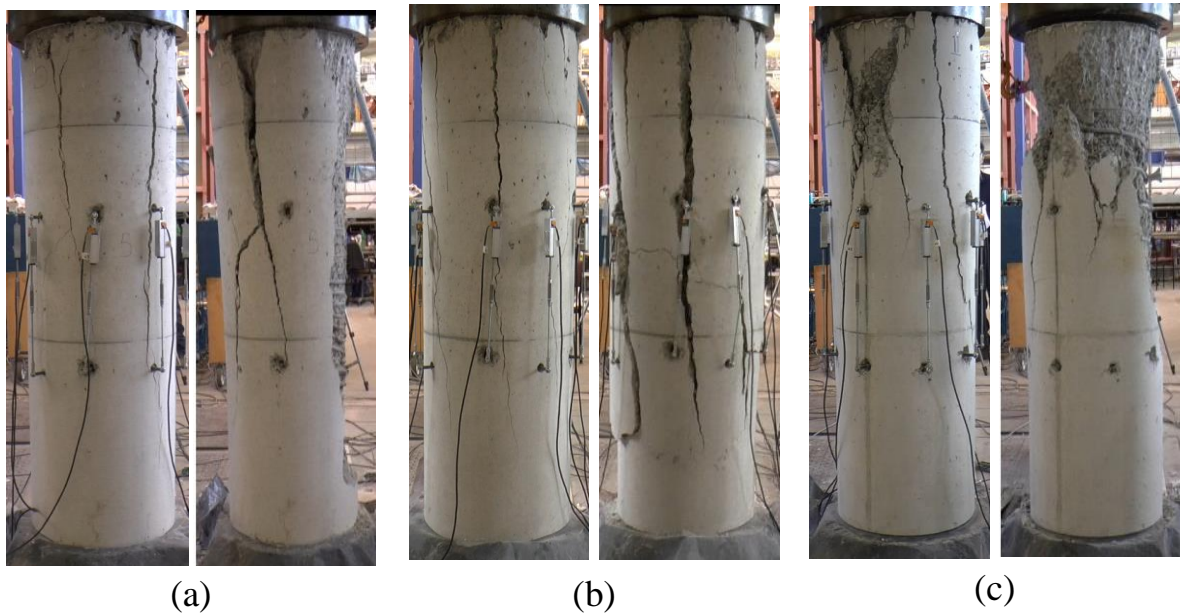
Damage status of column at peak load and the end of the test (a) high-confined column (b) medium-confined column (c) low-confined column
